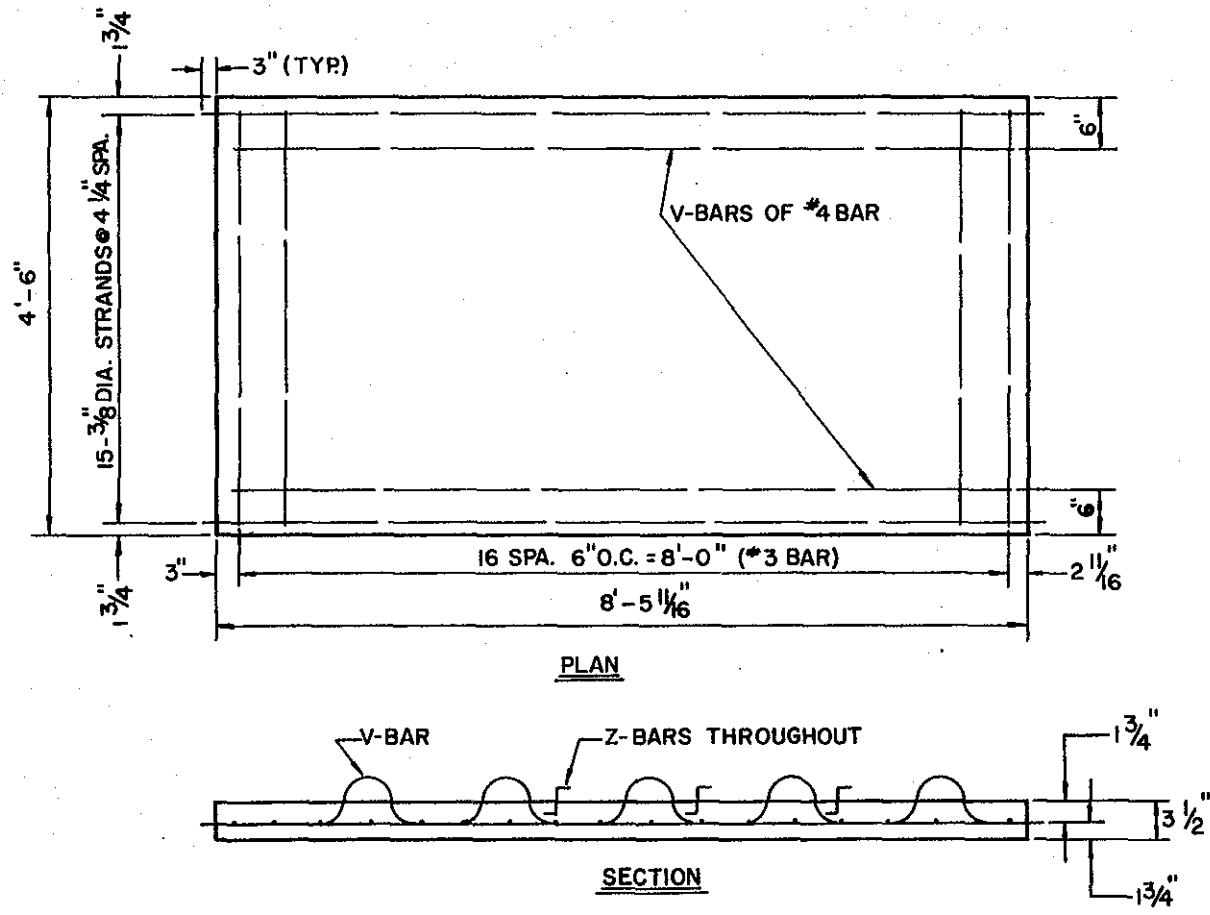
Detail of Panels Used in Slab Segment for Loading No. 4 (Trinity River Bridge Panel).
